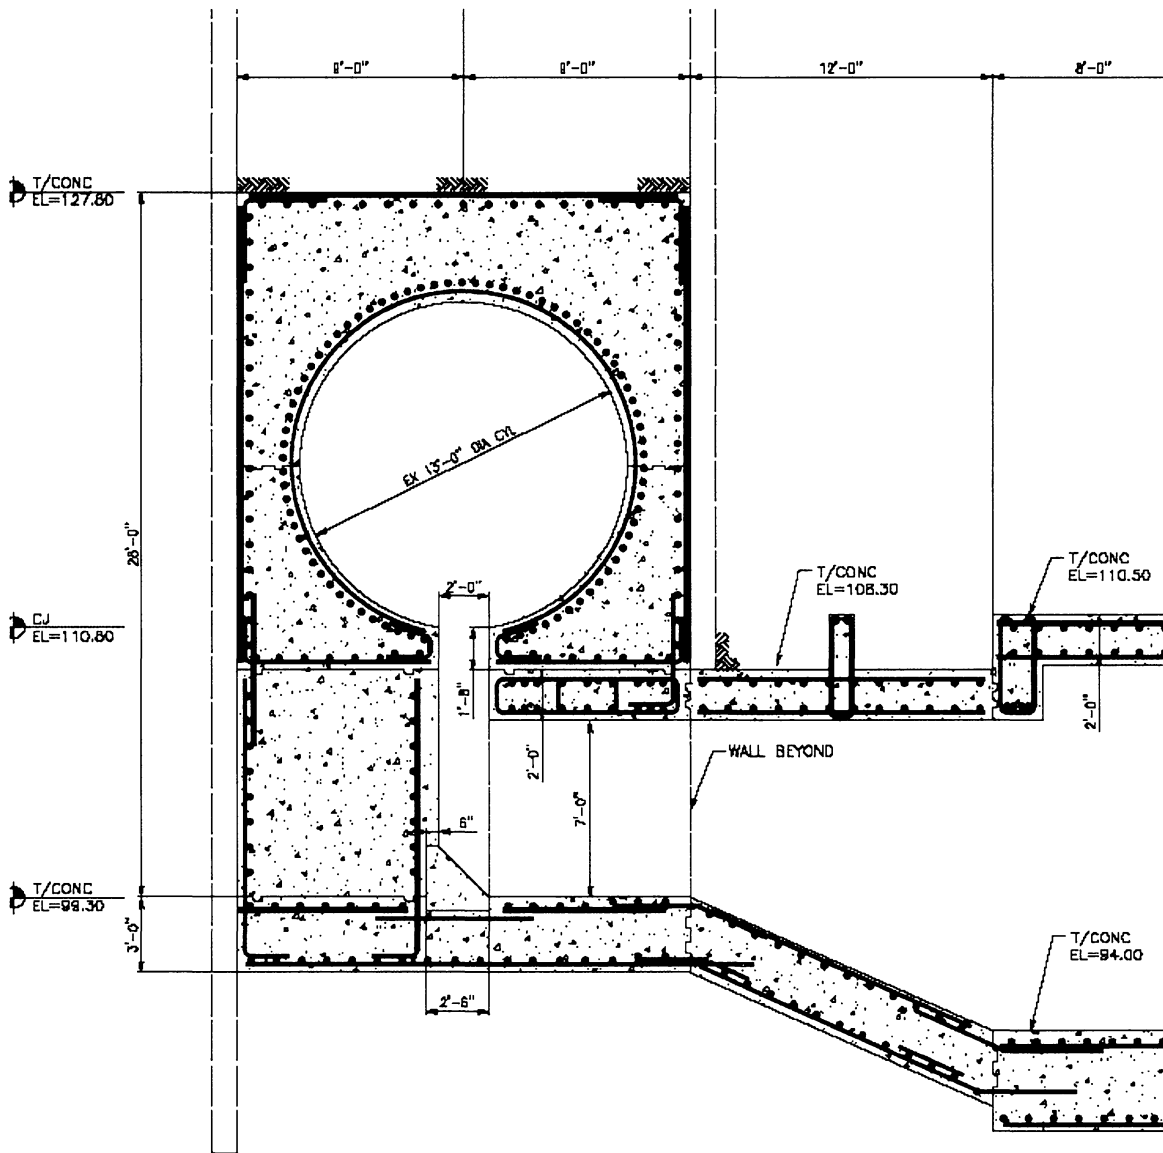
Section View of Proposed Bottom Outlet Slot Design at Site DS-4 (provided by Wade Trim)
